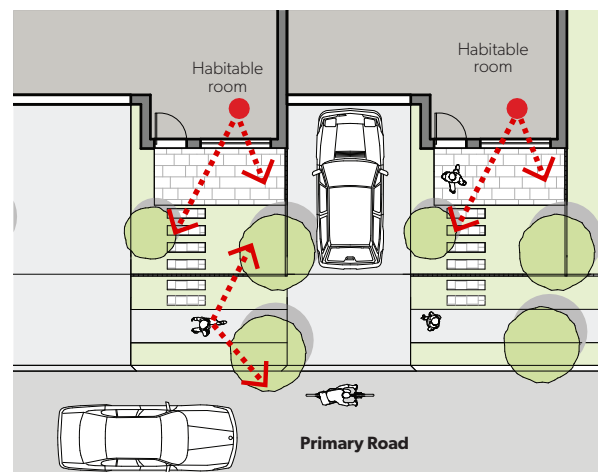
New buildings should contribute to and improve the existing streetscape. Windows and porches should be included in the street elevation to increase passive surveillance.
